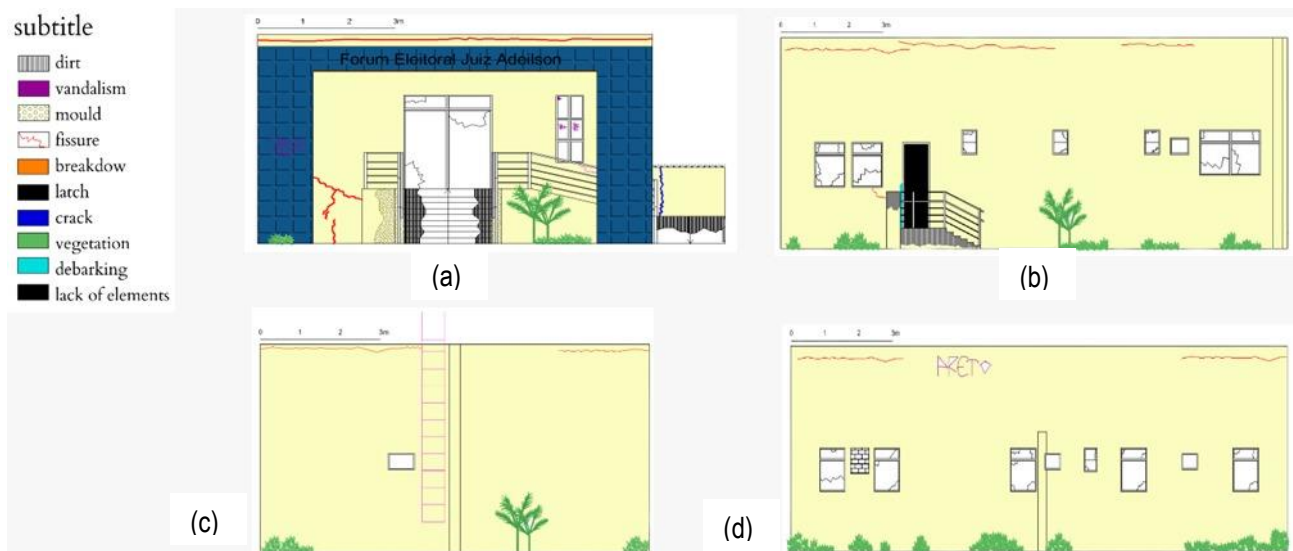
Damage map of the former Teixeira electoral justice building - (a) front facade (b) right side facade (c) rear facade and (d) left side facade
